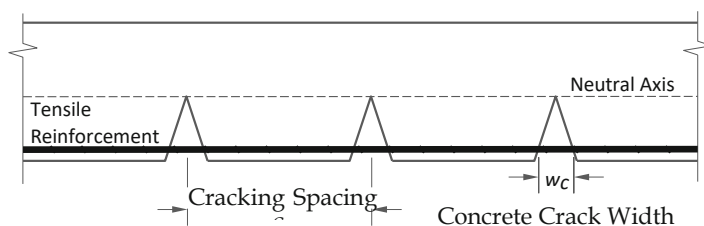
Steel and concrete bond separation due to flexural cracks [13].
